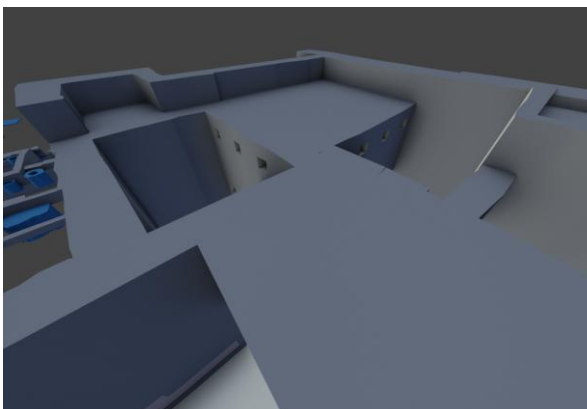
Alternative reconstruction scenarios have a significant effect on interior light conditions in building SE corner.
